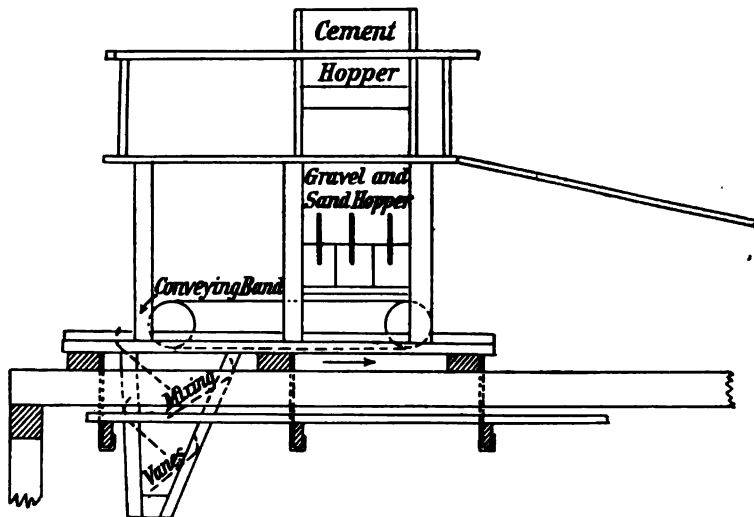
Sutcliffe Concrete Mixer—Elevation.
